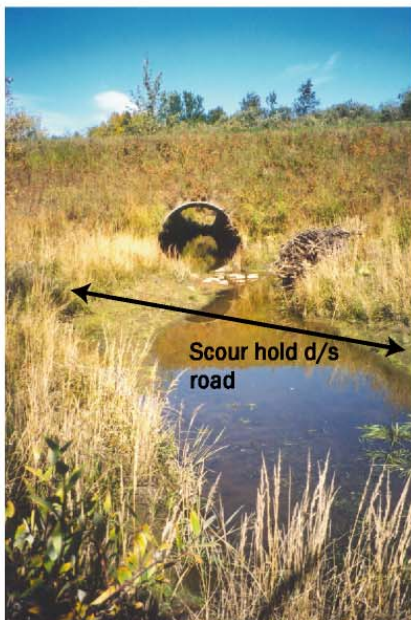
View of culvert downstream of road. Exposed soils immediately downstream of culvert will contribute sediment to stream (restoration opportunity) (September 17/2002).
